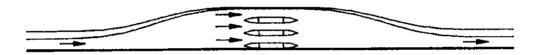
Typical Layout of Tollgate on Ramp Way
